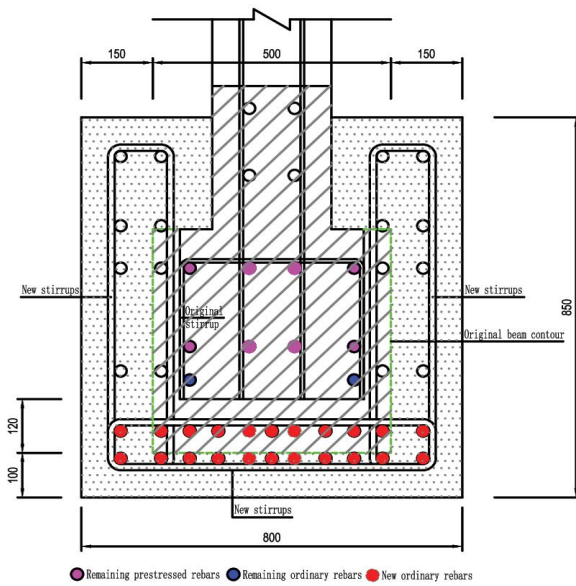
Sectional view of T-beam after enlarged section reinforcement.
